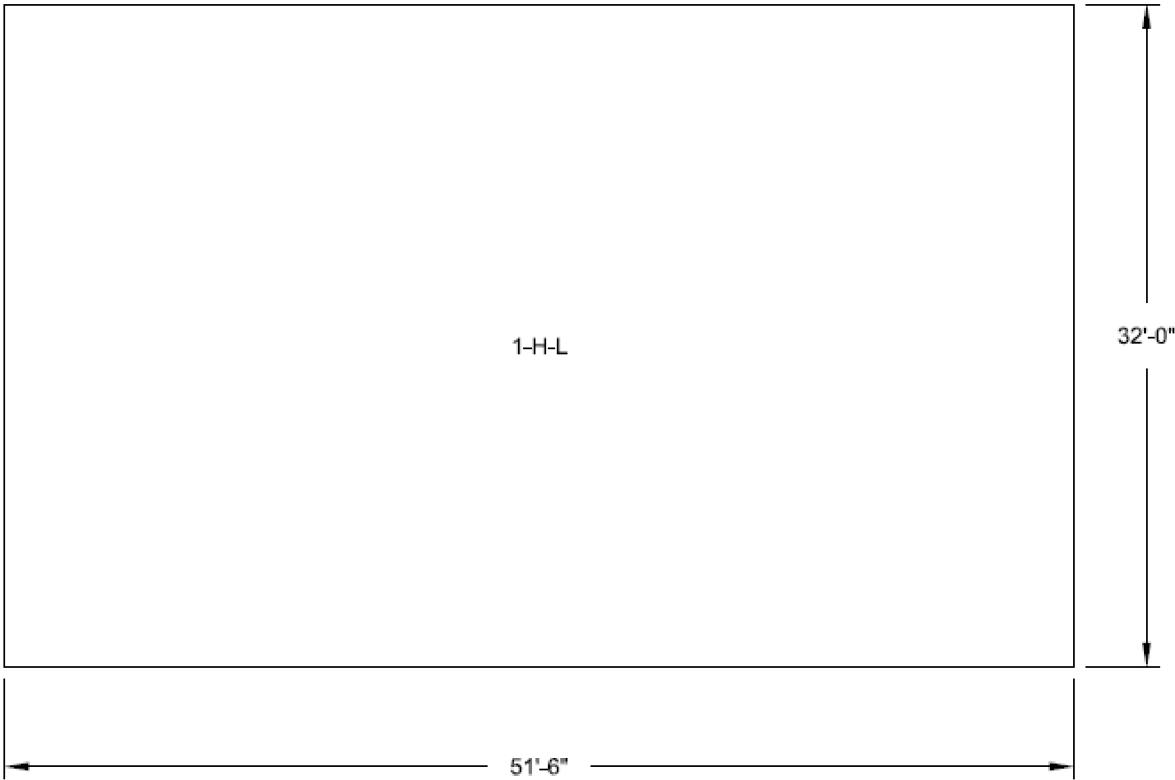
H.6-147 DGFOSV Roof 2 Looking Down Horizontal Reinforcement Zones Near Side Face
